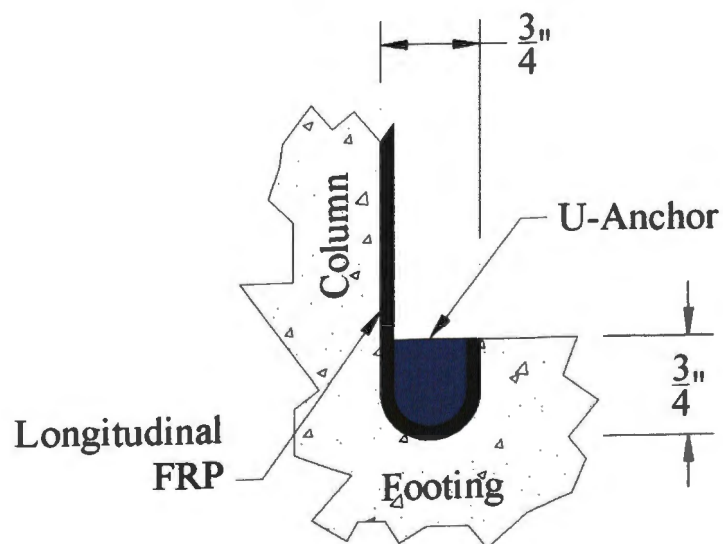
U-Anchors Used on East and West Faces of Columns #2 and #3
